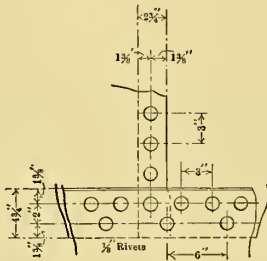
DETAIL OF RIVETING ABOVE 25 FEET.
